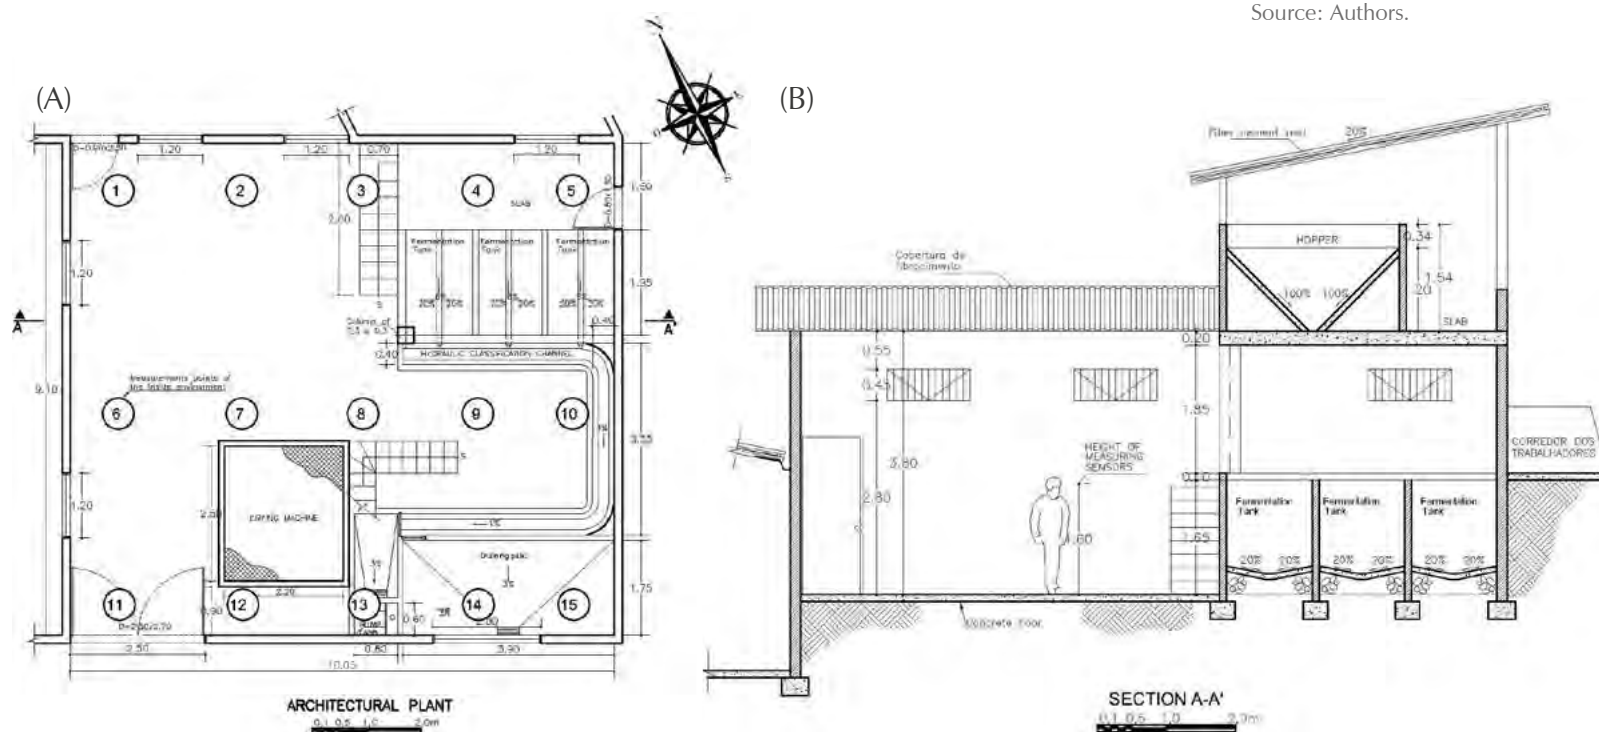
Building 1. (A) Distribution of measurement points (in circles) in the architectural plan; (B) Cross-section plan
